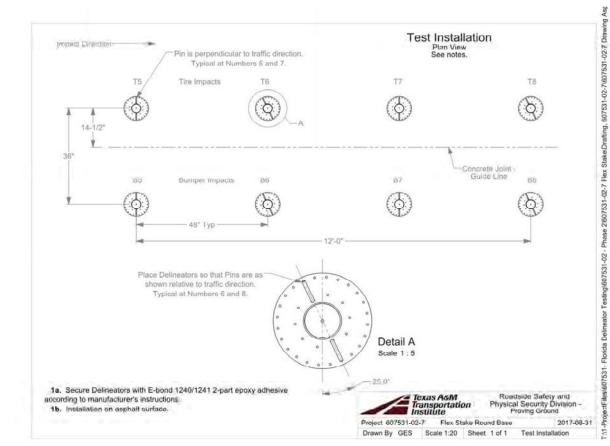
607531-02-7 Test Setup on Asphalt Surface.
